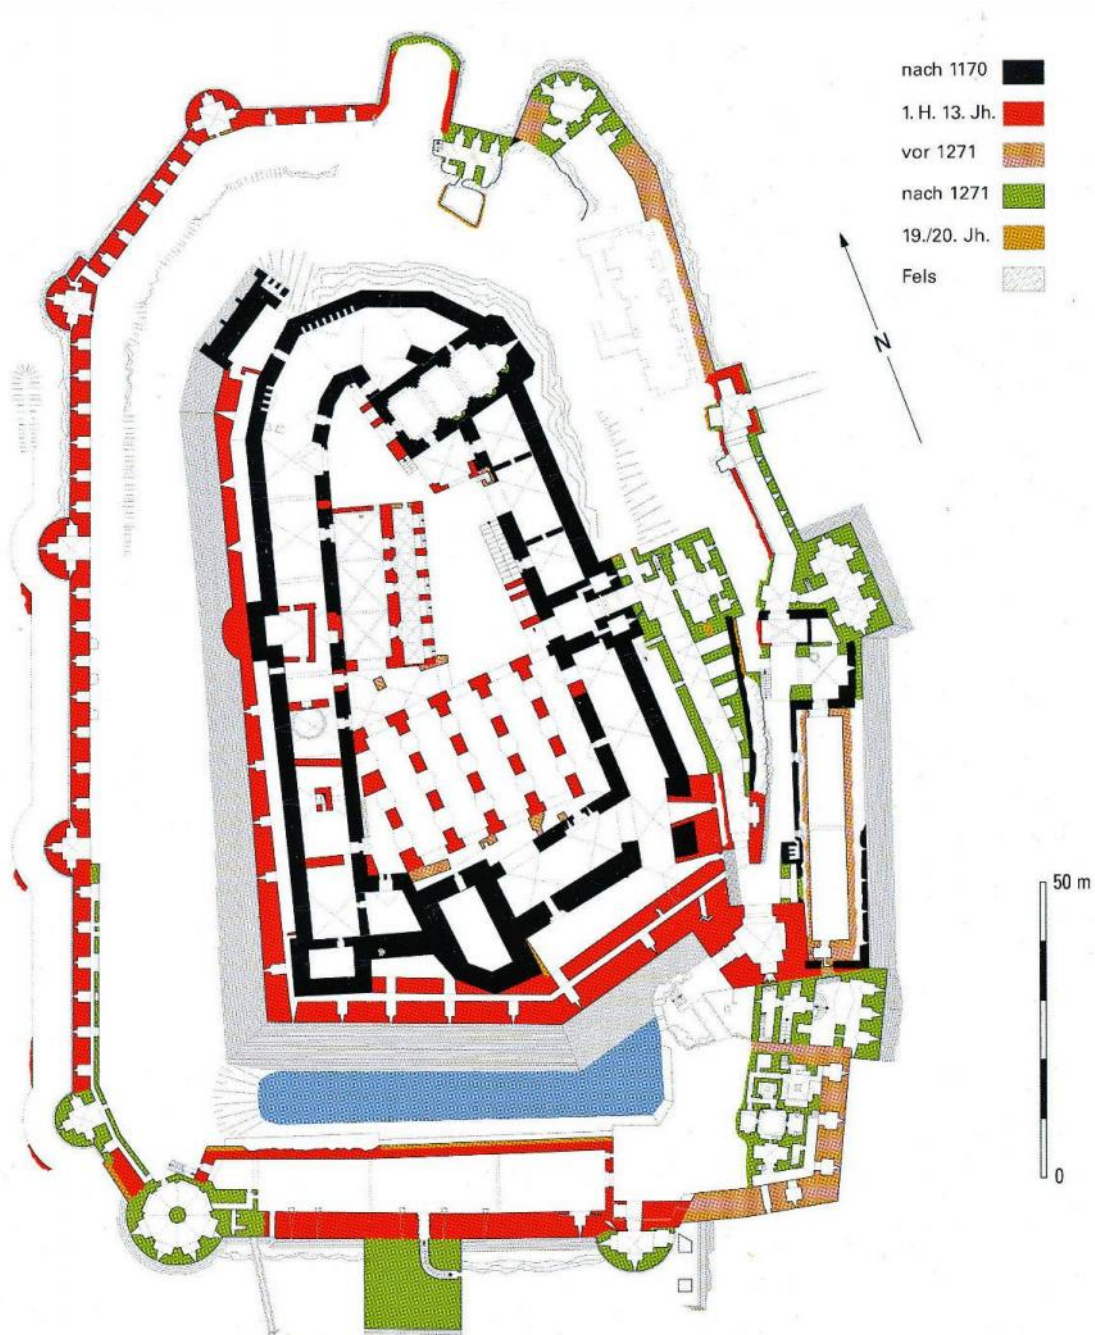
Crac des Chevaliers, construction age plan on the level of the ground floor. (*Biller et al. 2006*)
